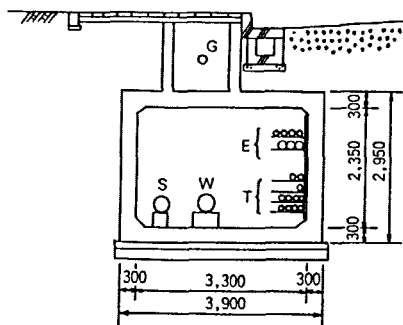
Cross Section of Takarazuka City Common Duct (units: mm)
